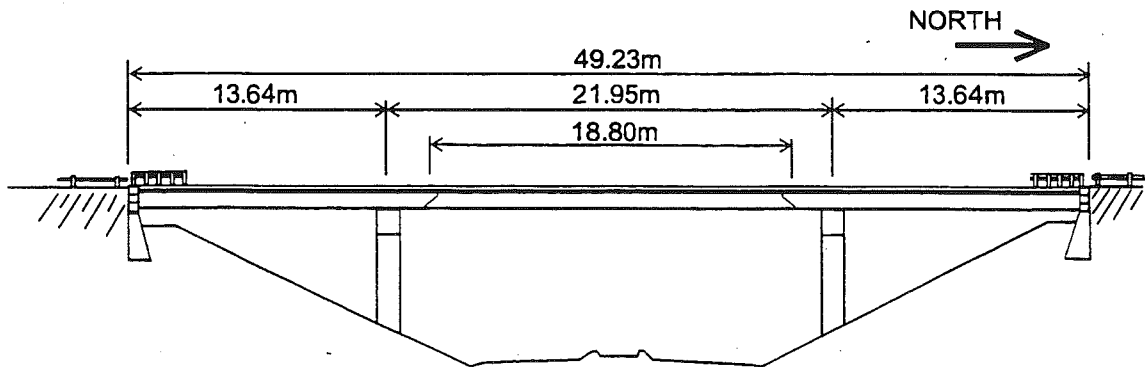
Elevation of the Bridge M66/RR (R01-78054), St. Joseph County.
